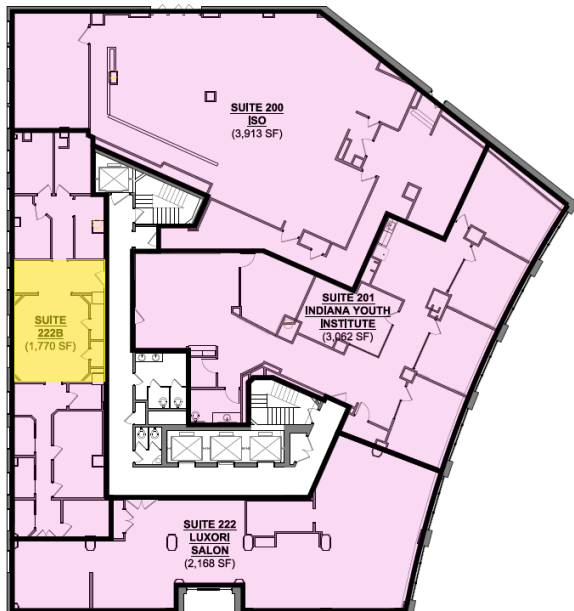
Floor Plan, Barber Shop (Suite 222B) Highlighted in Yellow
